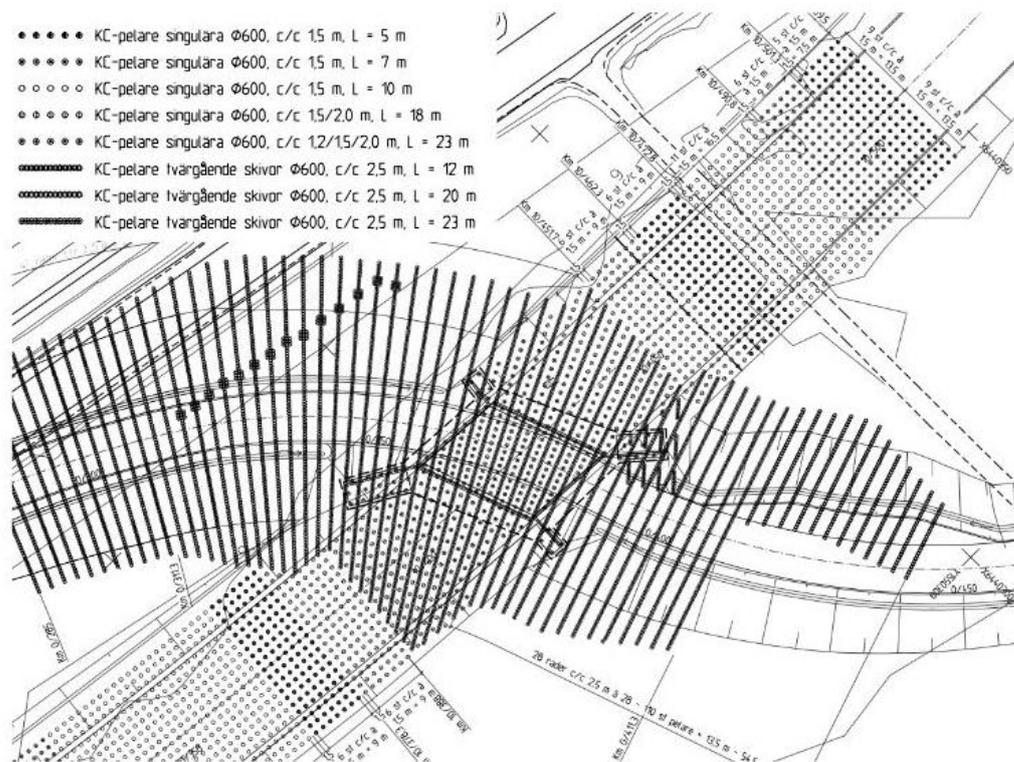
Column pattern overview (Sweco Infrastructure AB, 2010)
